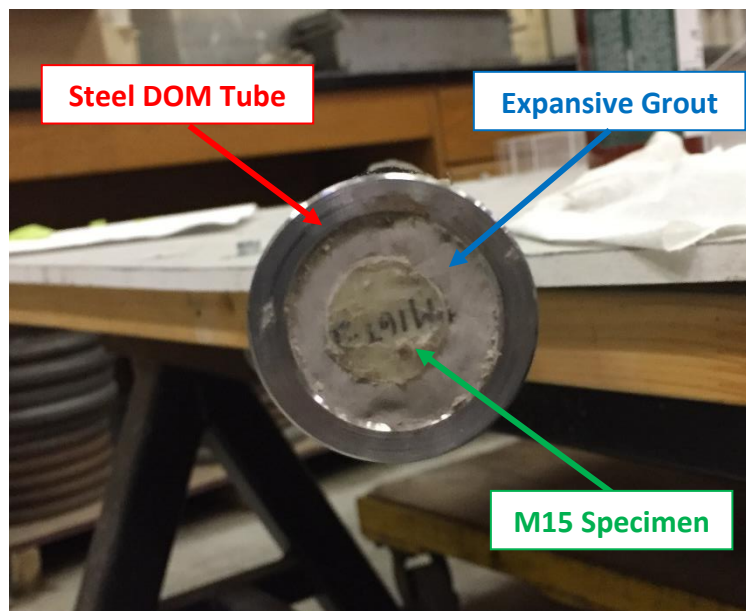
Cross-section of M15 GFRP Specimen Preparation After Casting Expansive Grout
